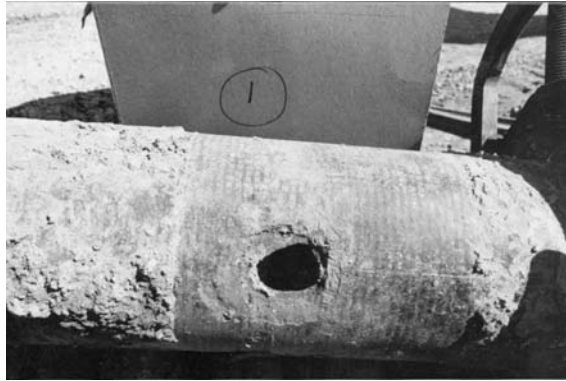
Cast iron pipe: O.D. 176 mm (6 in) by 10 mm (0.4 in) W.T.; single large corrosion hole, ~5 cm (1.97 in) diameter
